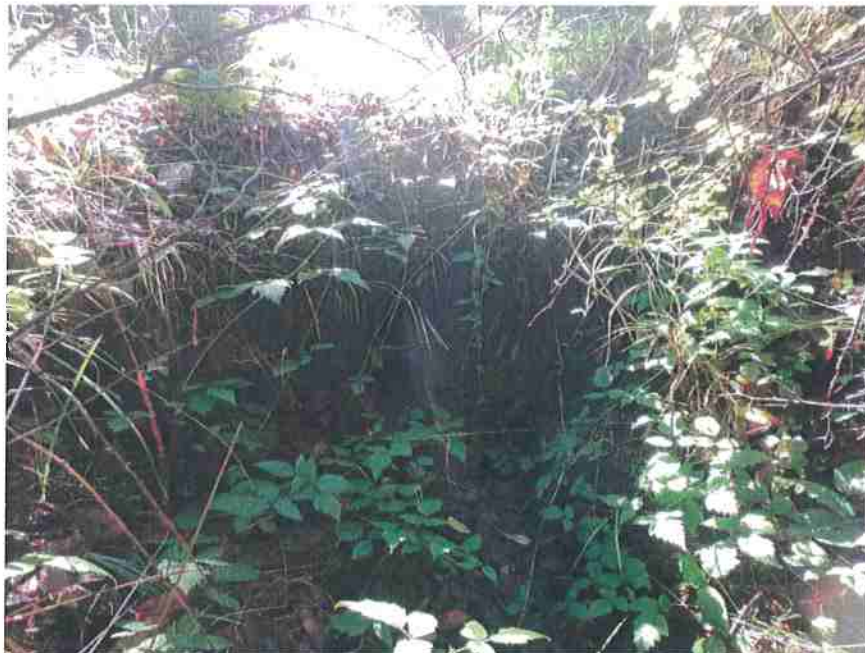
Stream Crossing #2, view of 24-inch diameter culvert inlet. Upstream of the culvert inlet, a fair amount of woody debris was observed, however the inlet was unencumbered at time of site visit.
